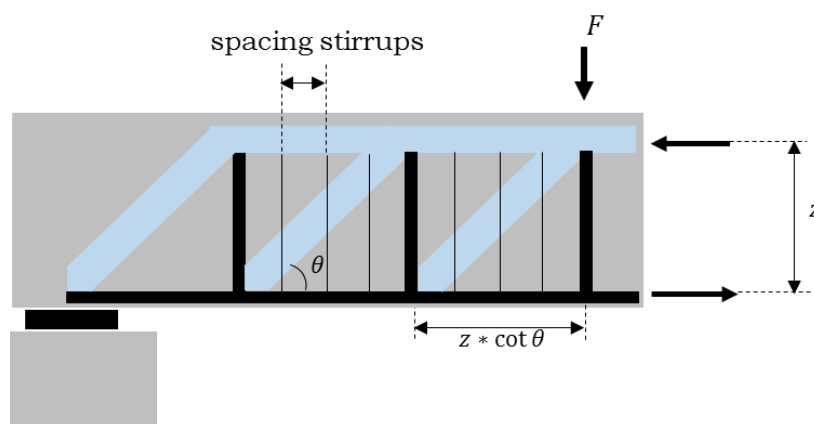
Truss analogy – Compressive diagonal intersecting multiple stirrups
